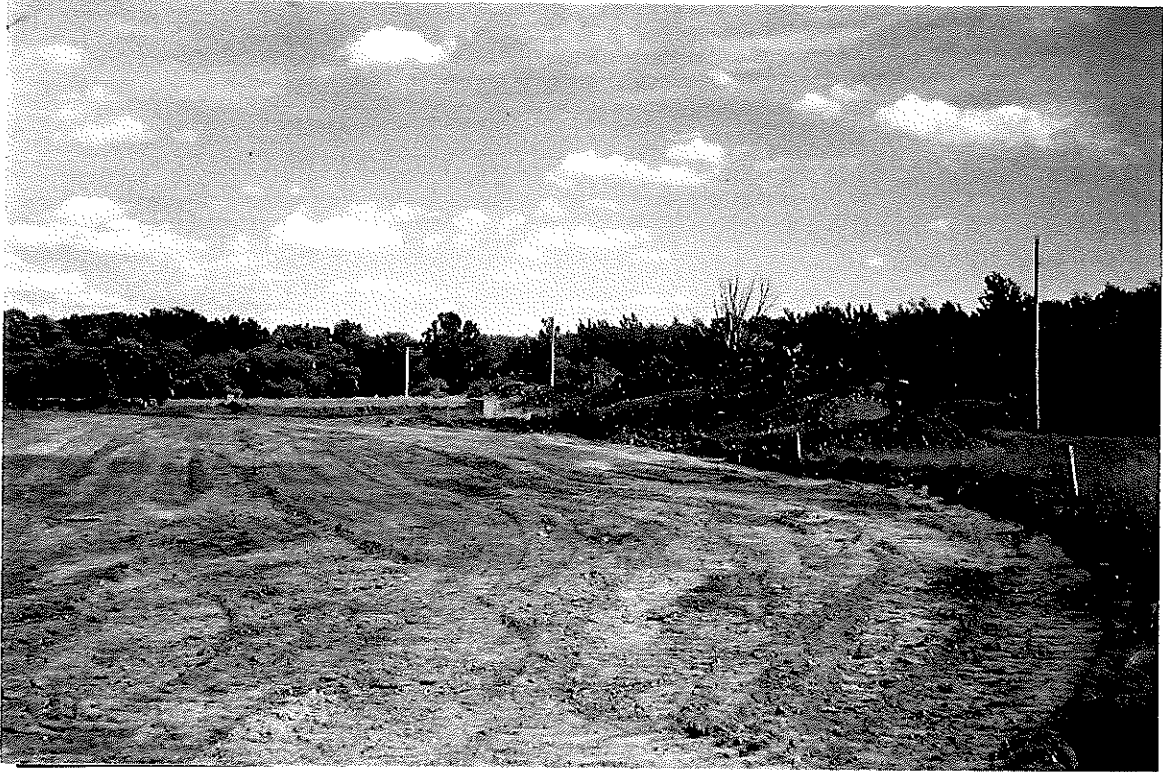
Stripping and stockpiling topsoil - Landfill Cap
